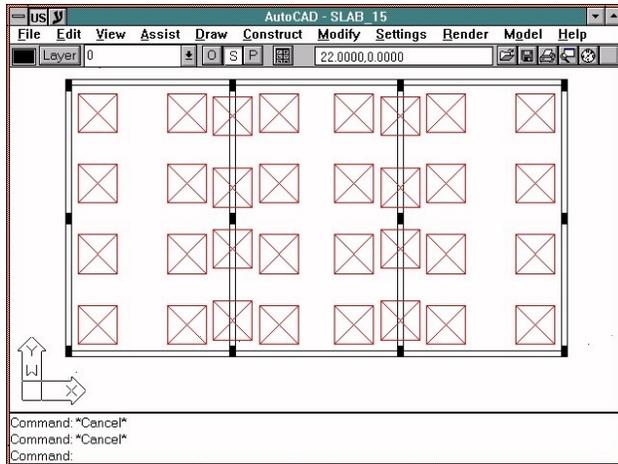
A typical Shoring Tower layout (Shapira 1998).
